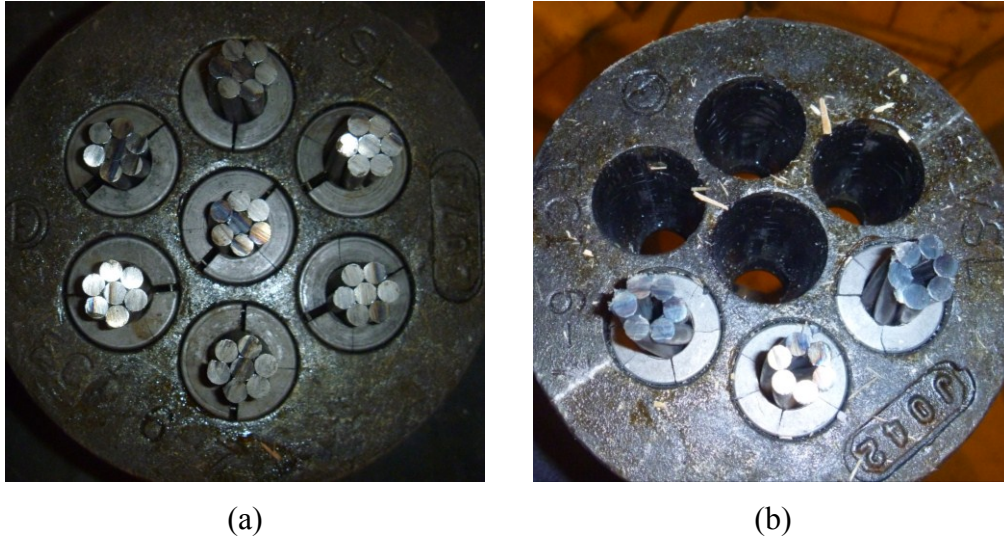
Gap between (a) standard and (b) modified wedge pieces after being loaded to failure.
